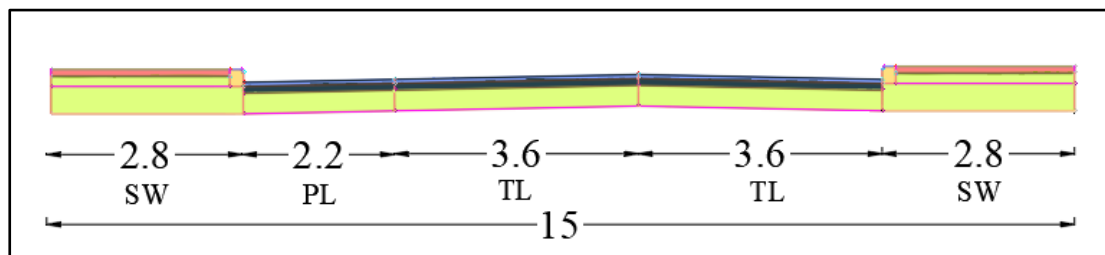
An-Najah University (Old Campus) Section No.1 Existing Cross Section
